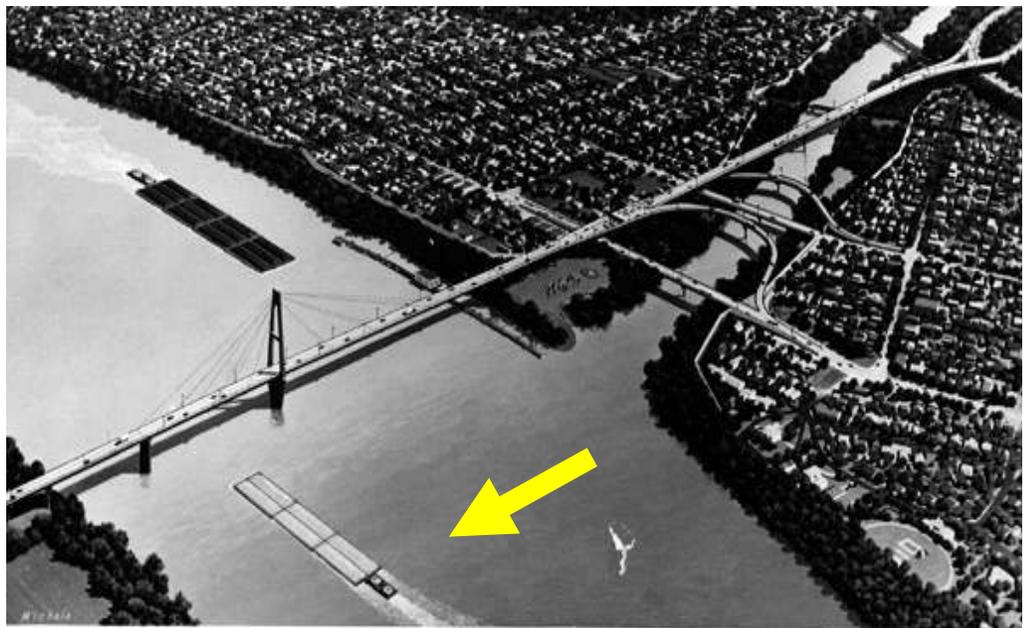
Southeast view of original, mid-stream, pylon location for the East Huntington, steel, cable-stayed bridge
